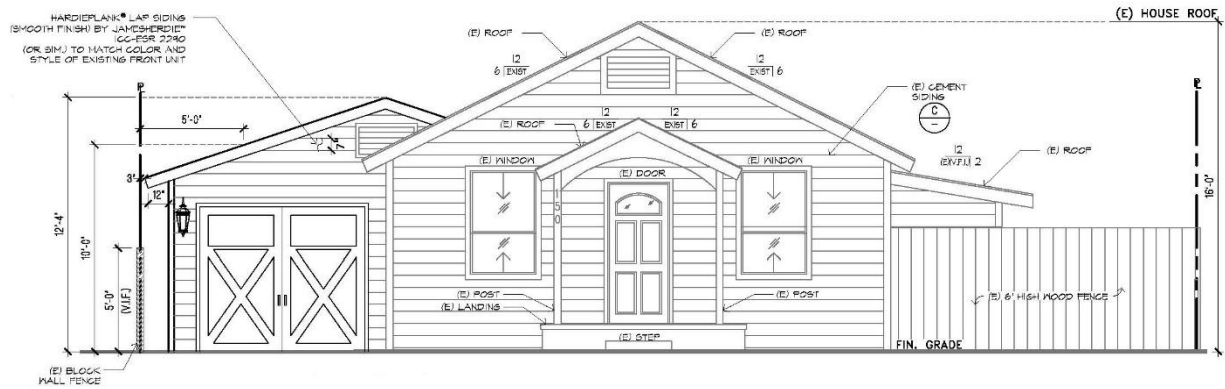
Proposed garage, primary elevation as viewed from South Parker Street (not to scale; Allstar Design and Engineering Group)
